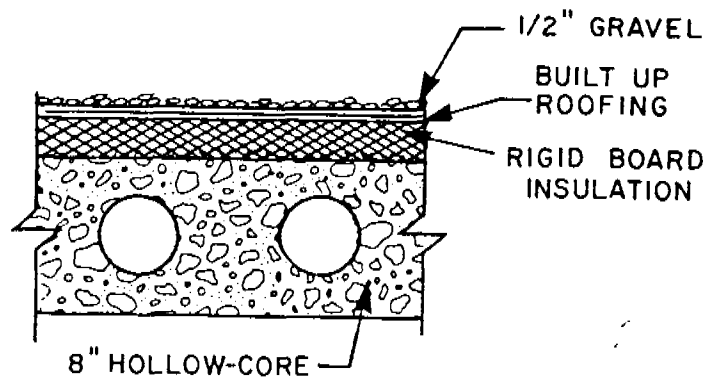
Precast Concrete Hollow-Core Roof for Residential Building (3)
